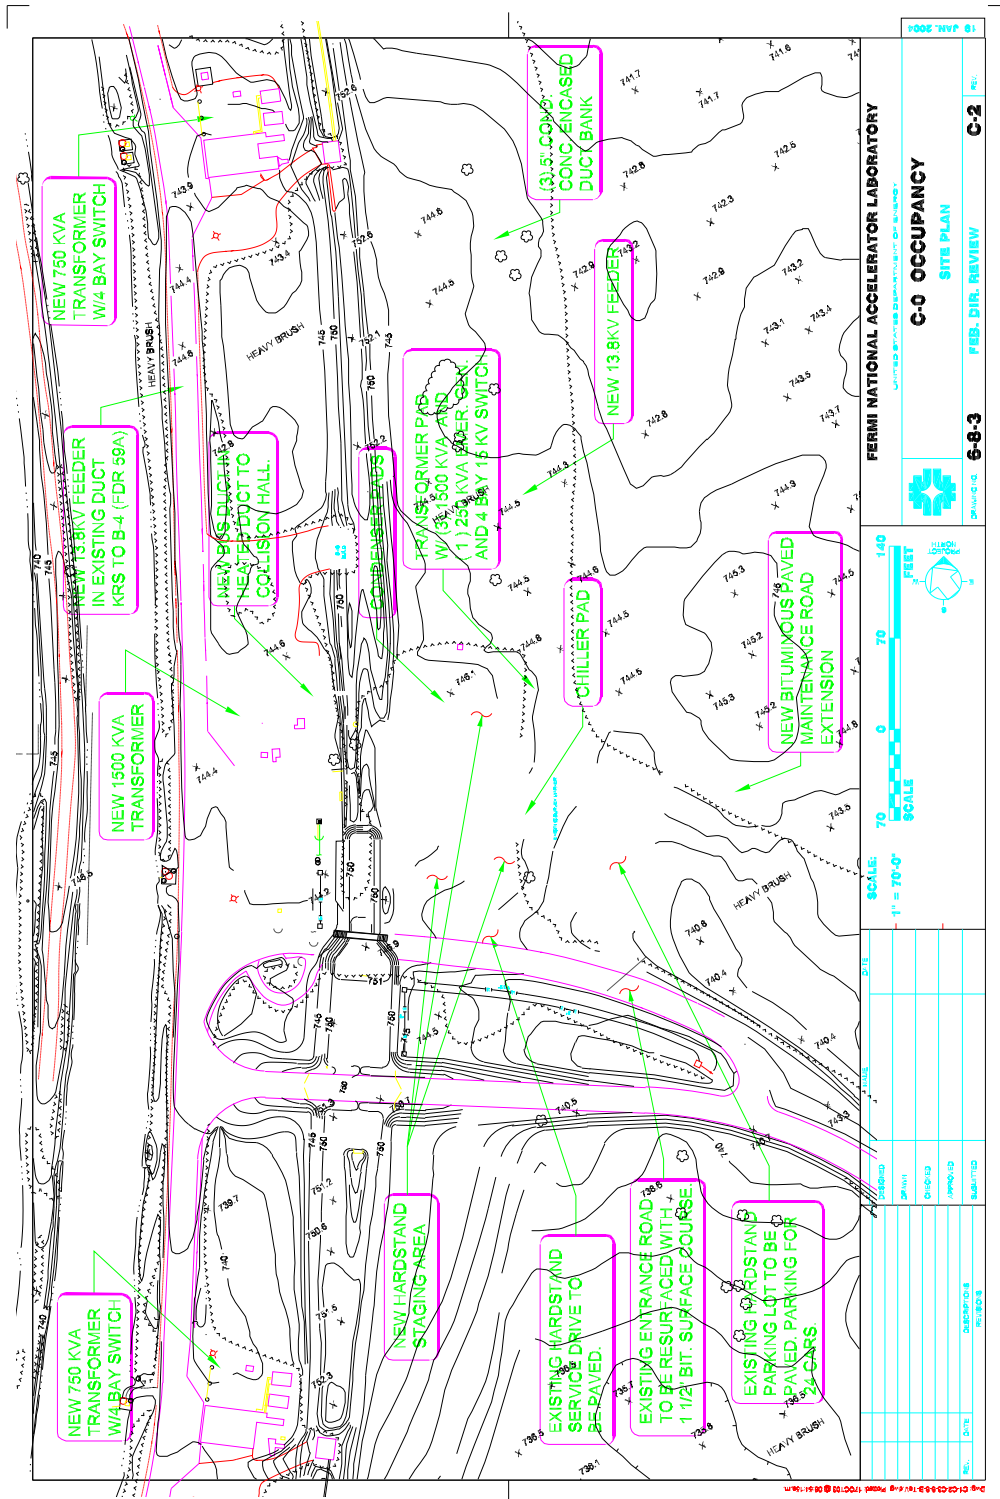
Layout of different buildings and components associated with the C-0 site.
